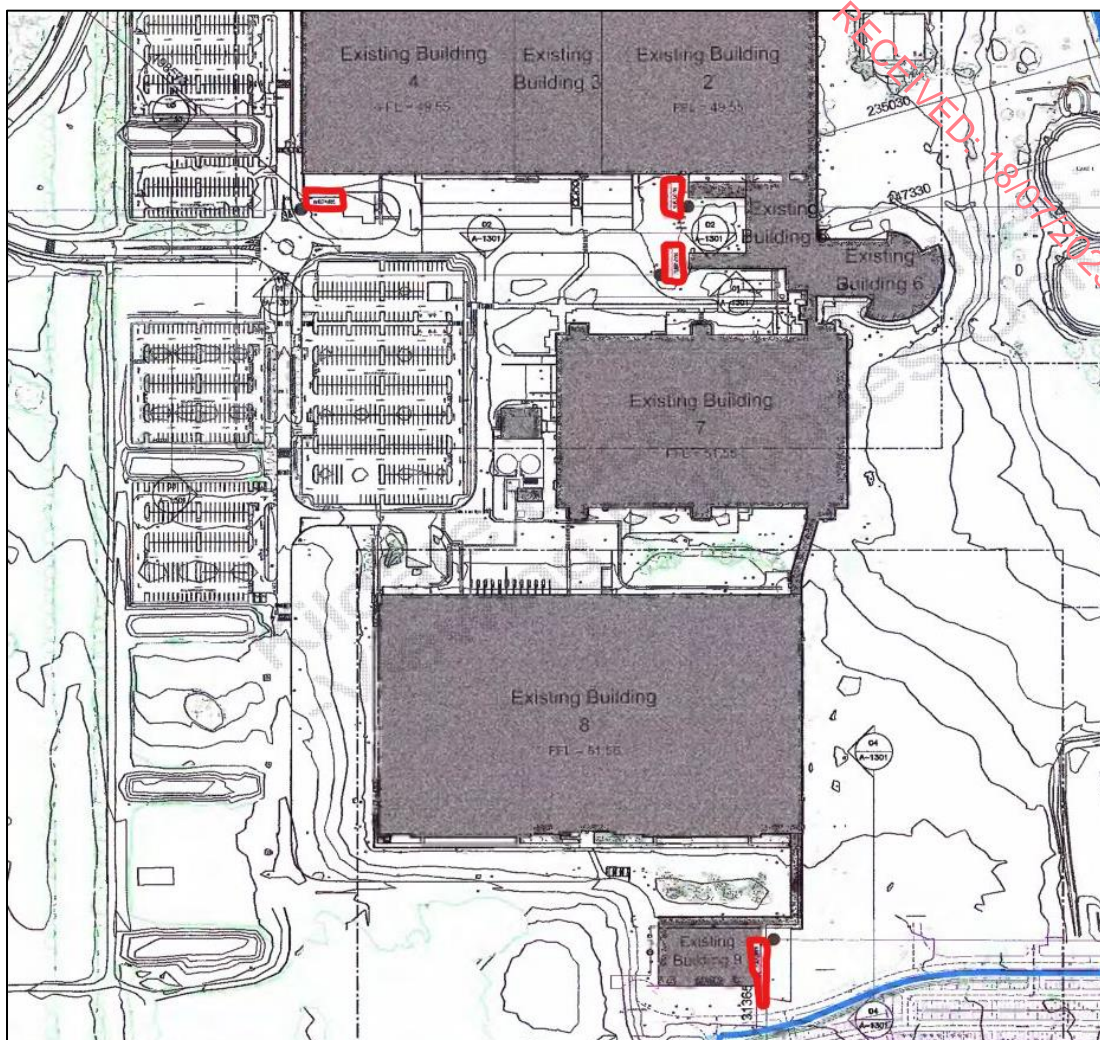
4 No. 20 kV substations Site Layout Plan. (Source: RKD.)
